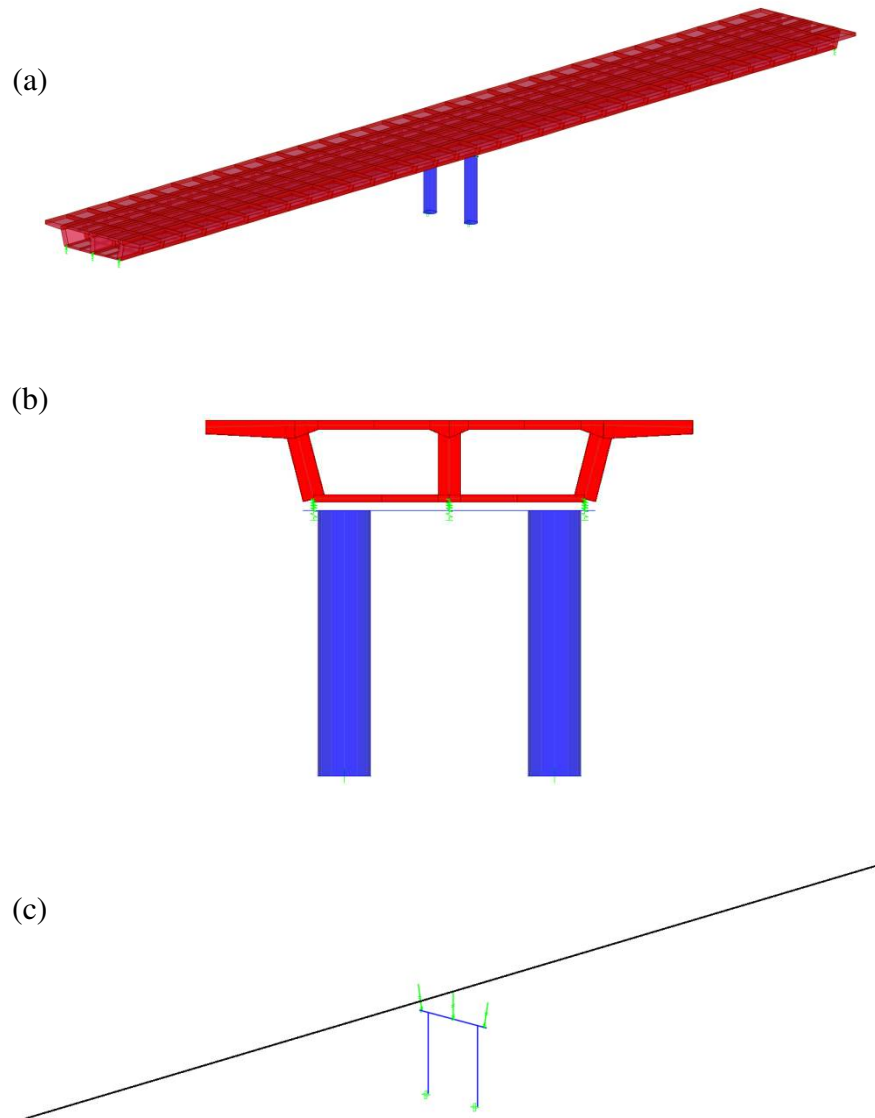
Finite element model of the bridge: (a) 3D extruded view, (b) cross section at pier, (c) line model.
